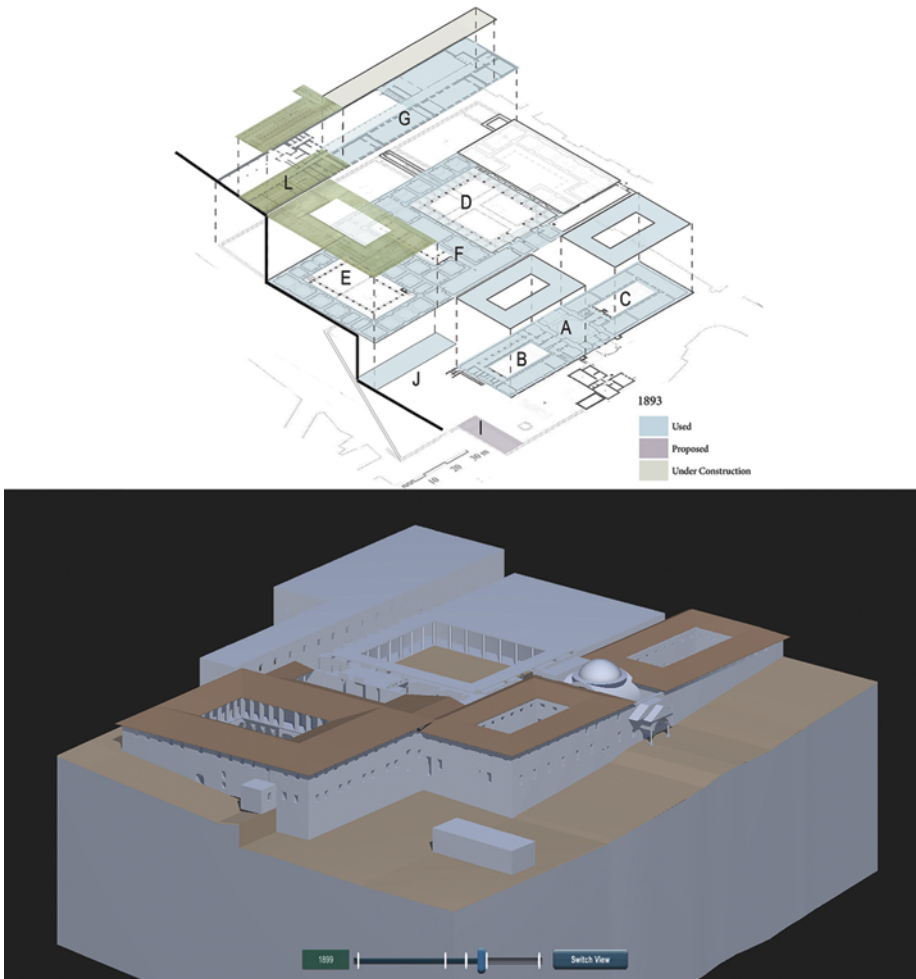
Toptaşı Asylum in 1893 and 1899. Top: 1893 Expansion Project transposed on the plan. The new sections proposed are shown in green: second floor of Section E and two floors of Section L. Source: Drawing by the author incorporating BOA DH.MKT. 19/37, 06 Z 1310 (21 June 1893). Bottom: Reconstruction of Toptaşı Asylum in 1899. Source: Created in SpatioScholar, © Özlüdil Altın, Wendell, Thompson.
